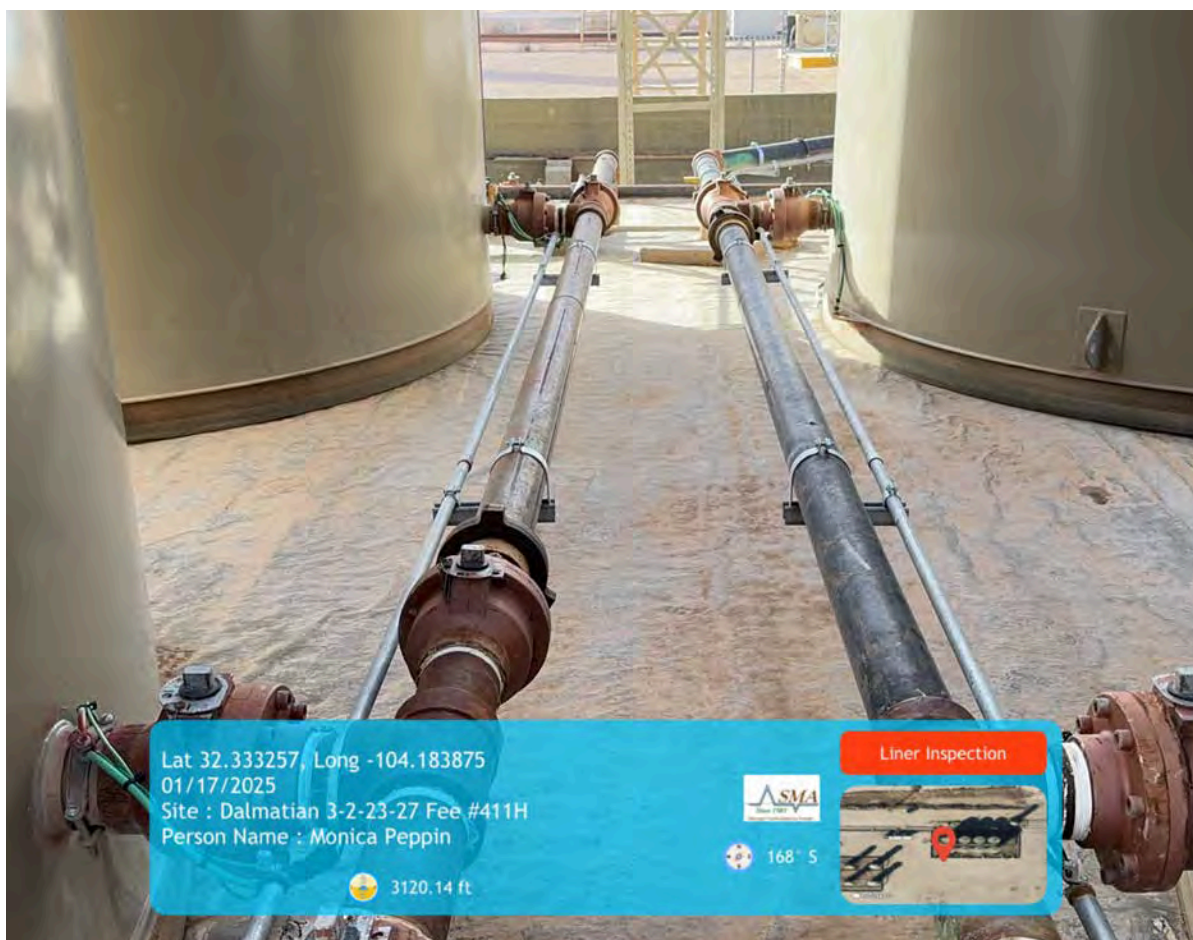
Liner view of south area of containment from southwest corner facing east.
